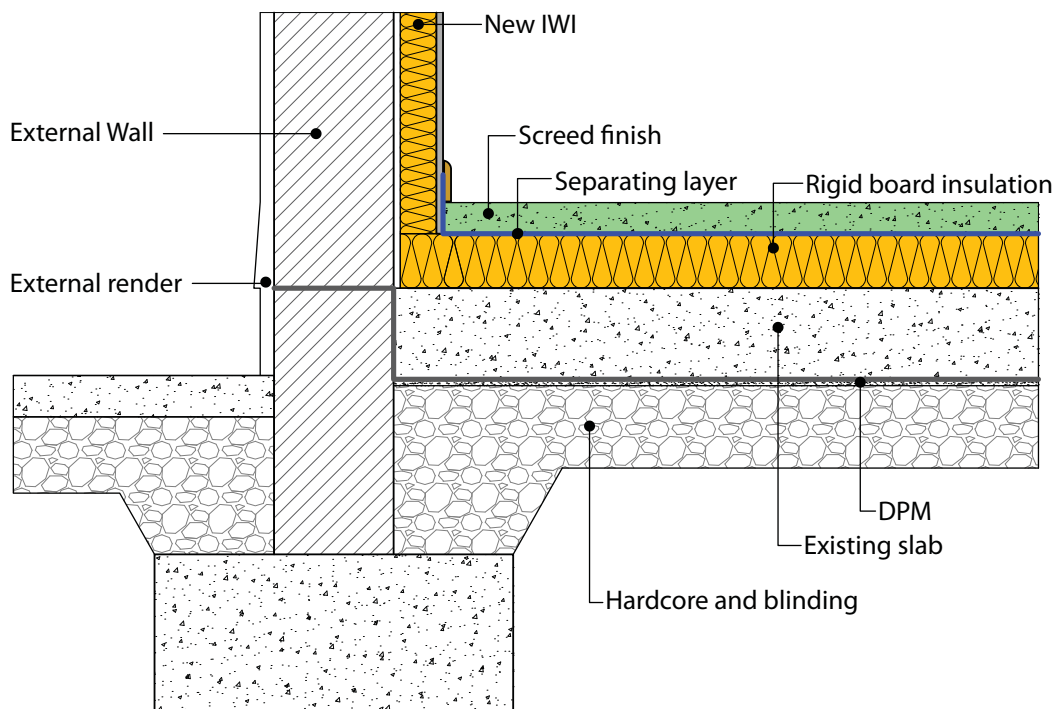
Insulation laid over an existing floor slab with internal wall insulation
